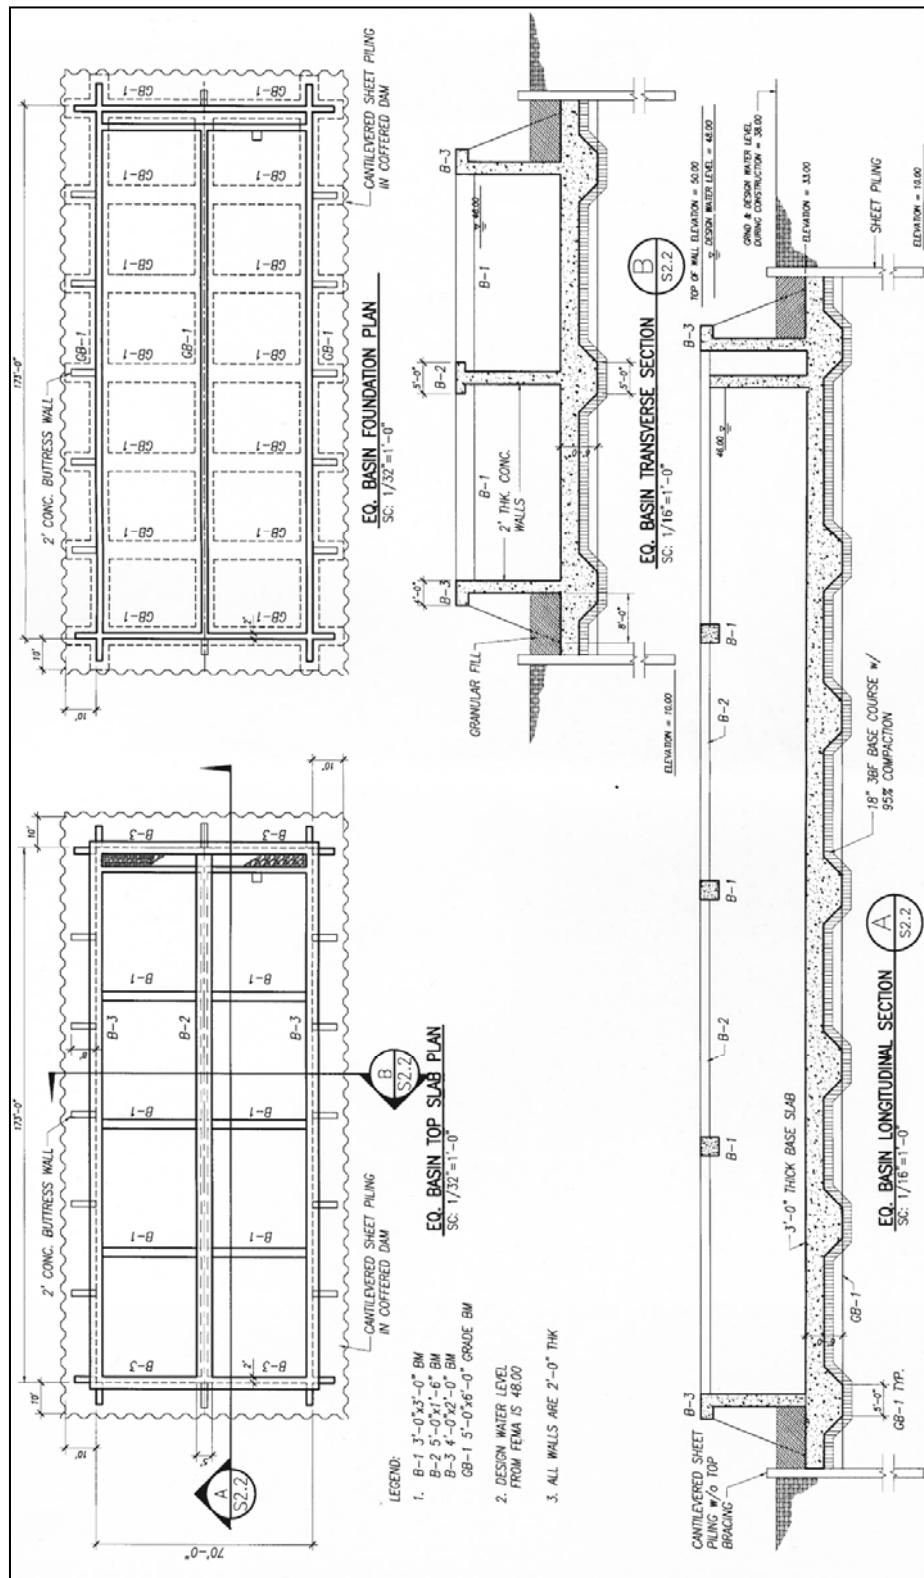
Option 2: Structural Foundation – 1 MG EQ Basin at Effluent Holding Pond
